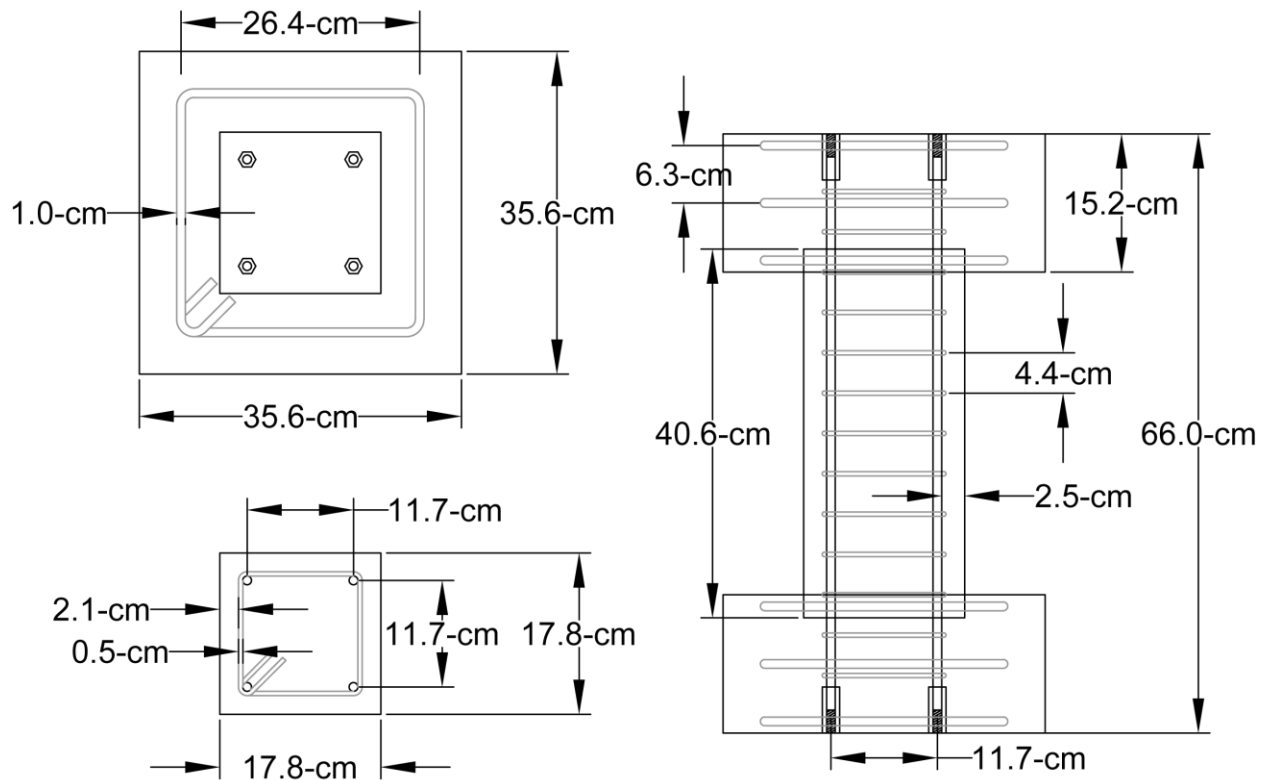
1: Cross section of model column (left), experimental column (center) and elevation detail drawing of the experimental column (right) (Drawing courtesy of Ian Williams).
